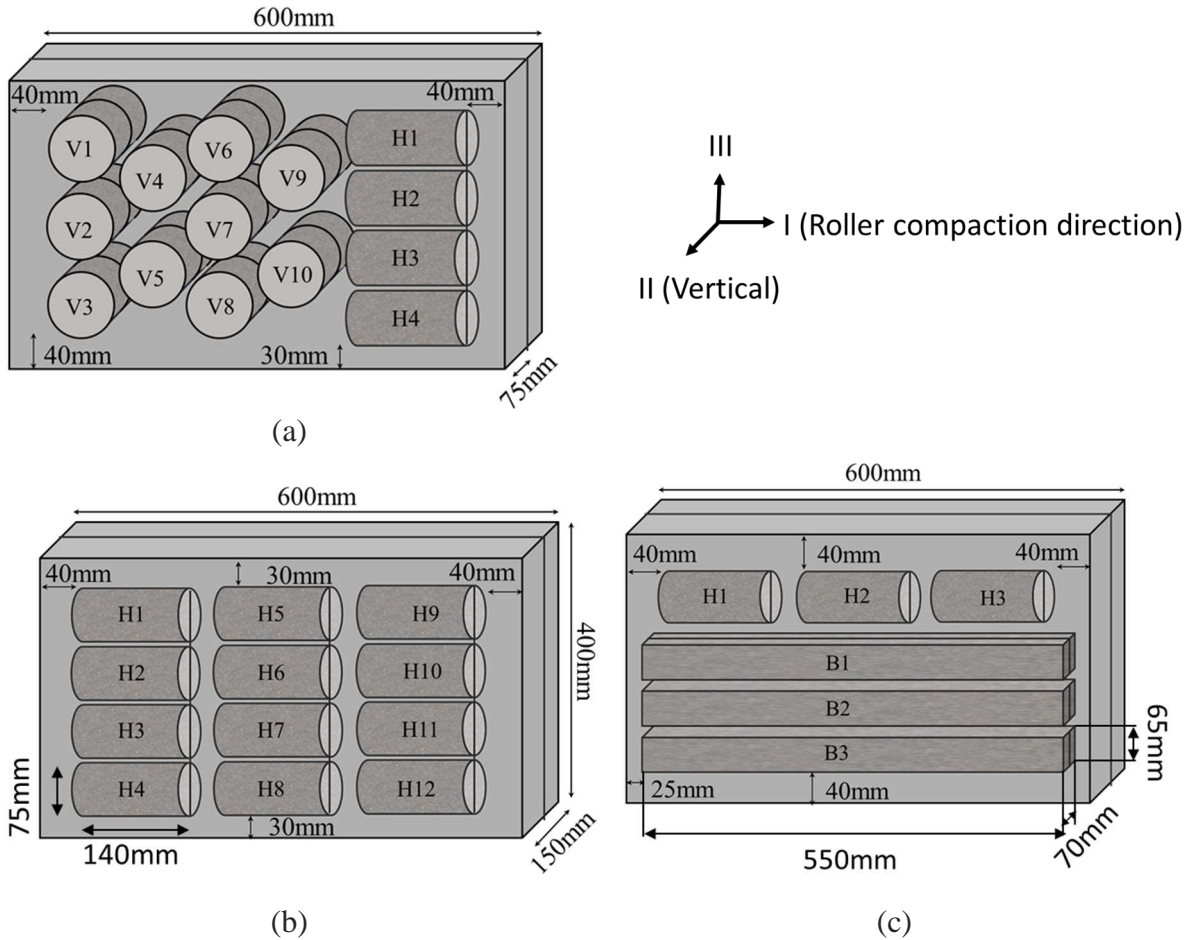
Coring plans in order to obtain three different types of specimen: (a) Plan 1: mix between specimens V and H, (b) Plan 2: specimens H, and (c) Plan 3: mix between specimen H and beams.
